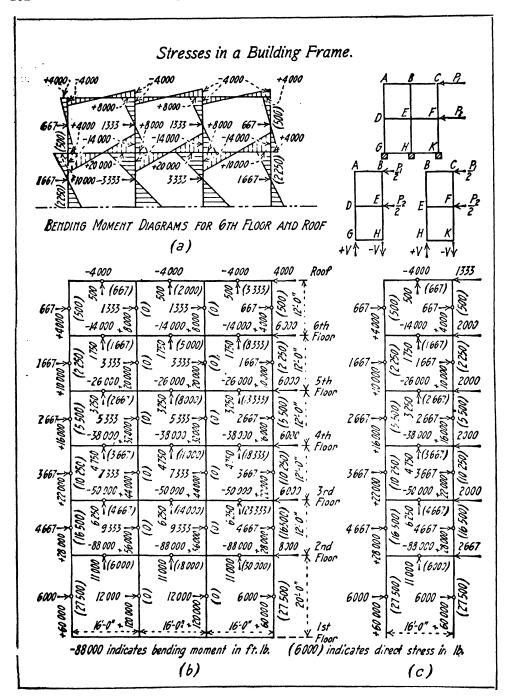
WIND STRESSES IN A STEEL FRAME BUILDING.
